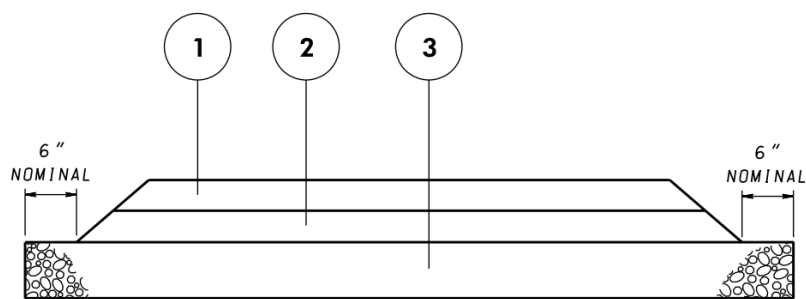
Porous Flexible Pavement Section (Flexipave, Perky pave or Equivalent)
